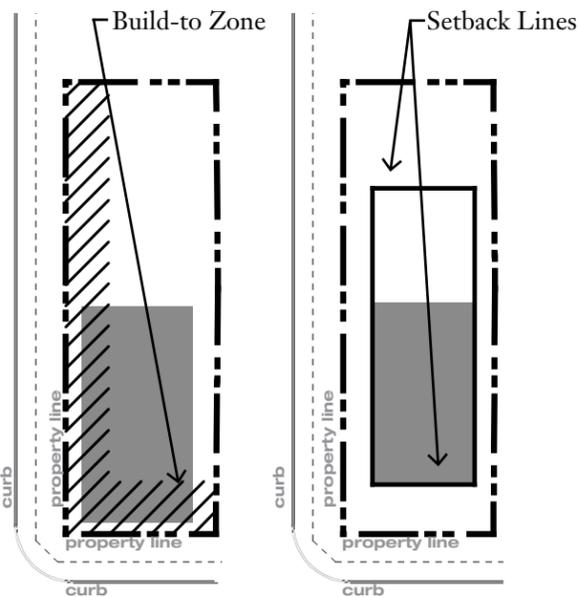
Build-to zones denote the minimum and maximum distances a building can be placed from a property line. The facade of a building must be located within this area. On the other hand, a setback line dictates the minimum distance a building may be constructed from a property line, meaning the building may be located anywhere beyond this line.
